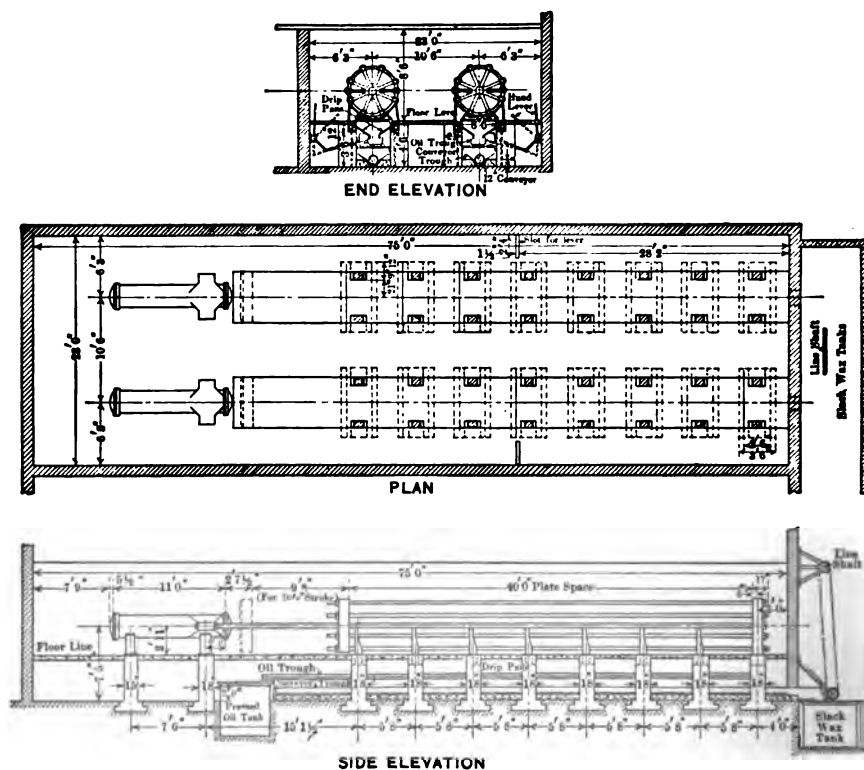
Setting plan of (2) 400 plate Carbondale soft wax presses.
